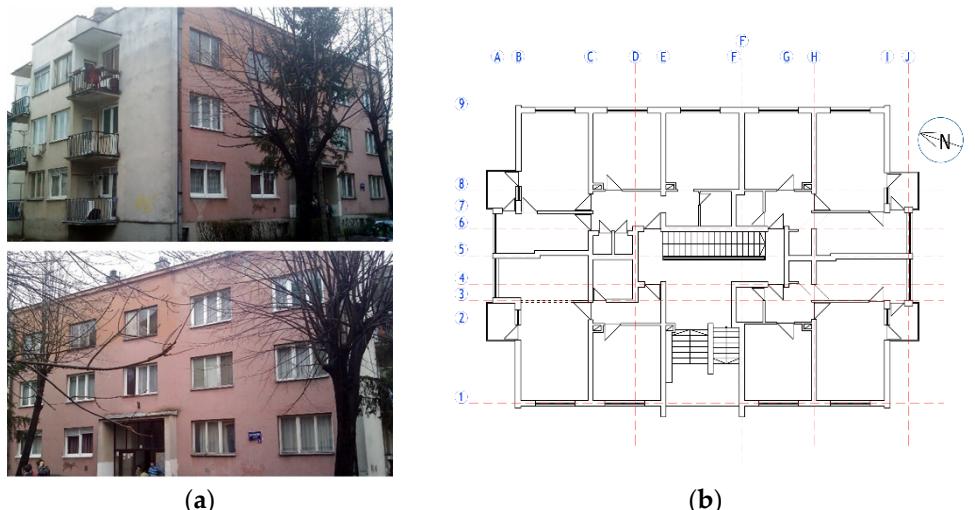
URM building located in Njegoševa Street No. 2, Kraljevo: (a) exterior views and (b) typical floor plan.
